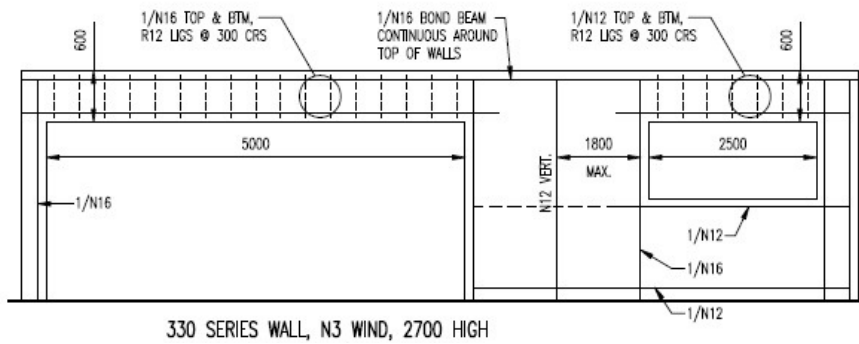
2700 High Wall, N3 Wind Rating, 330 Series ECO-Block (Max. roof load width: 10.0m)
